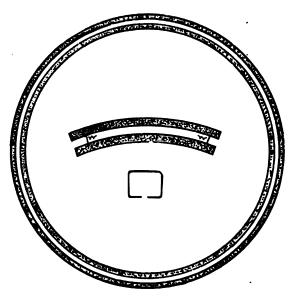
SILO OF CONCRETE BLOCKS (CROSS-SECTION).
